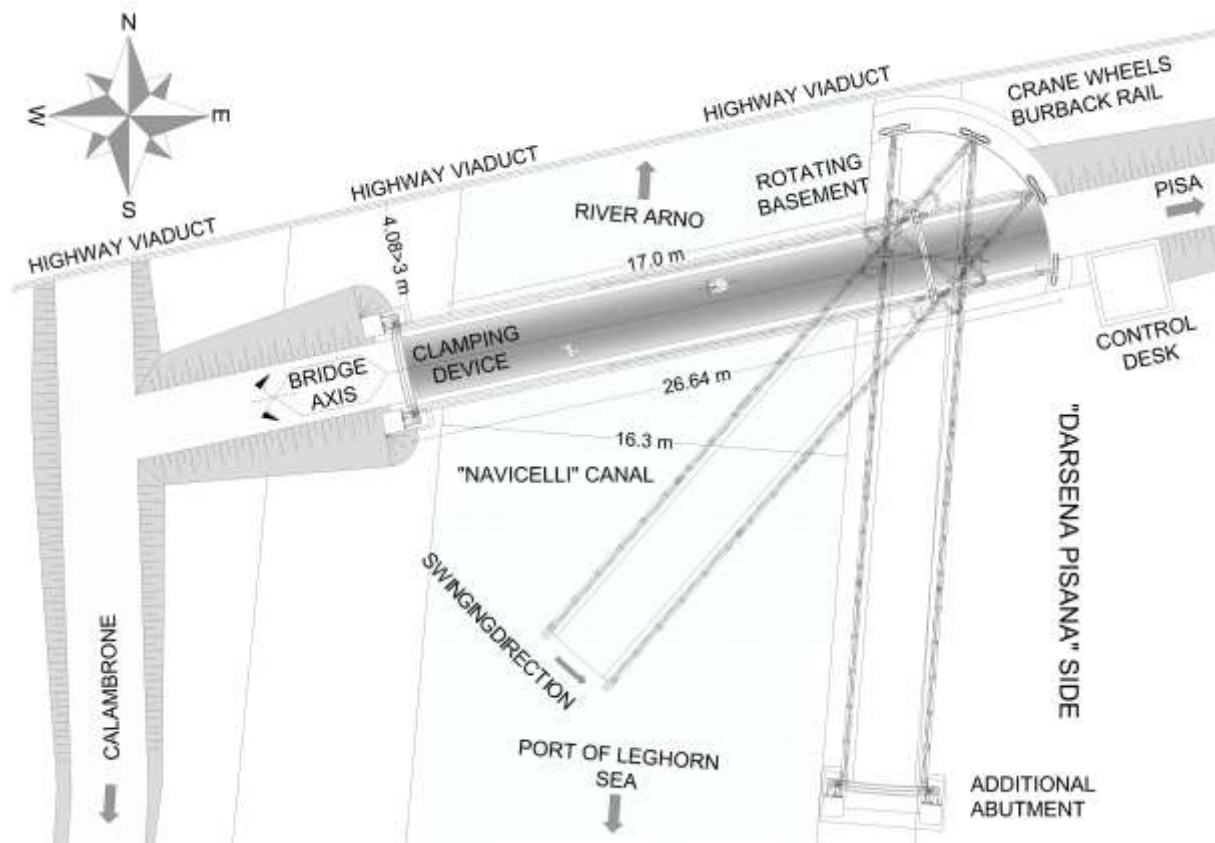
Plan view of the construction site and kinematics of the swinging mechanism.
